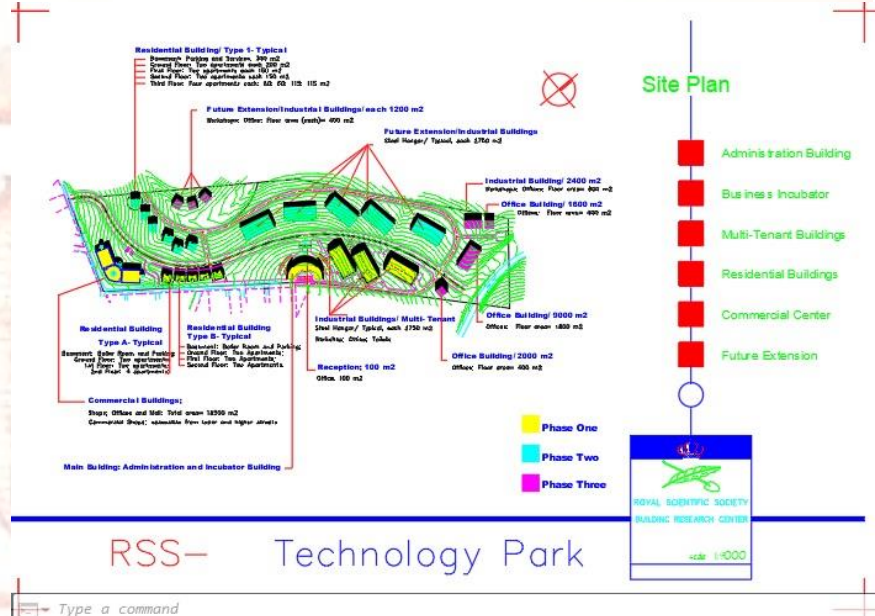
Urban & Buildings Design by Murad Kalaldehy
